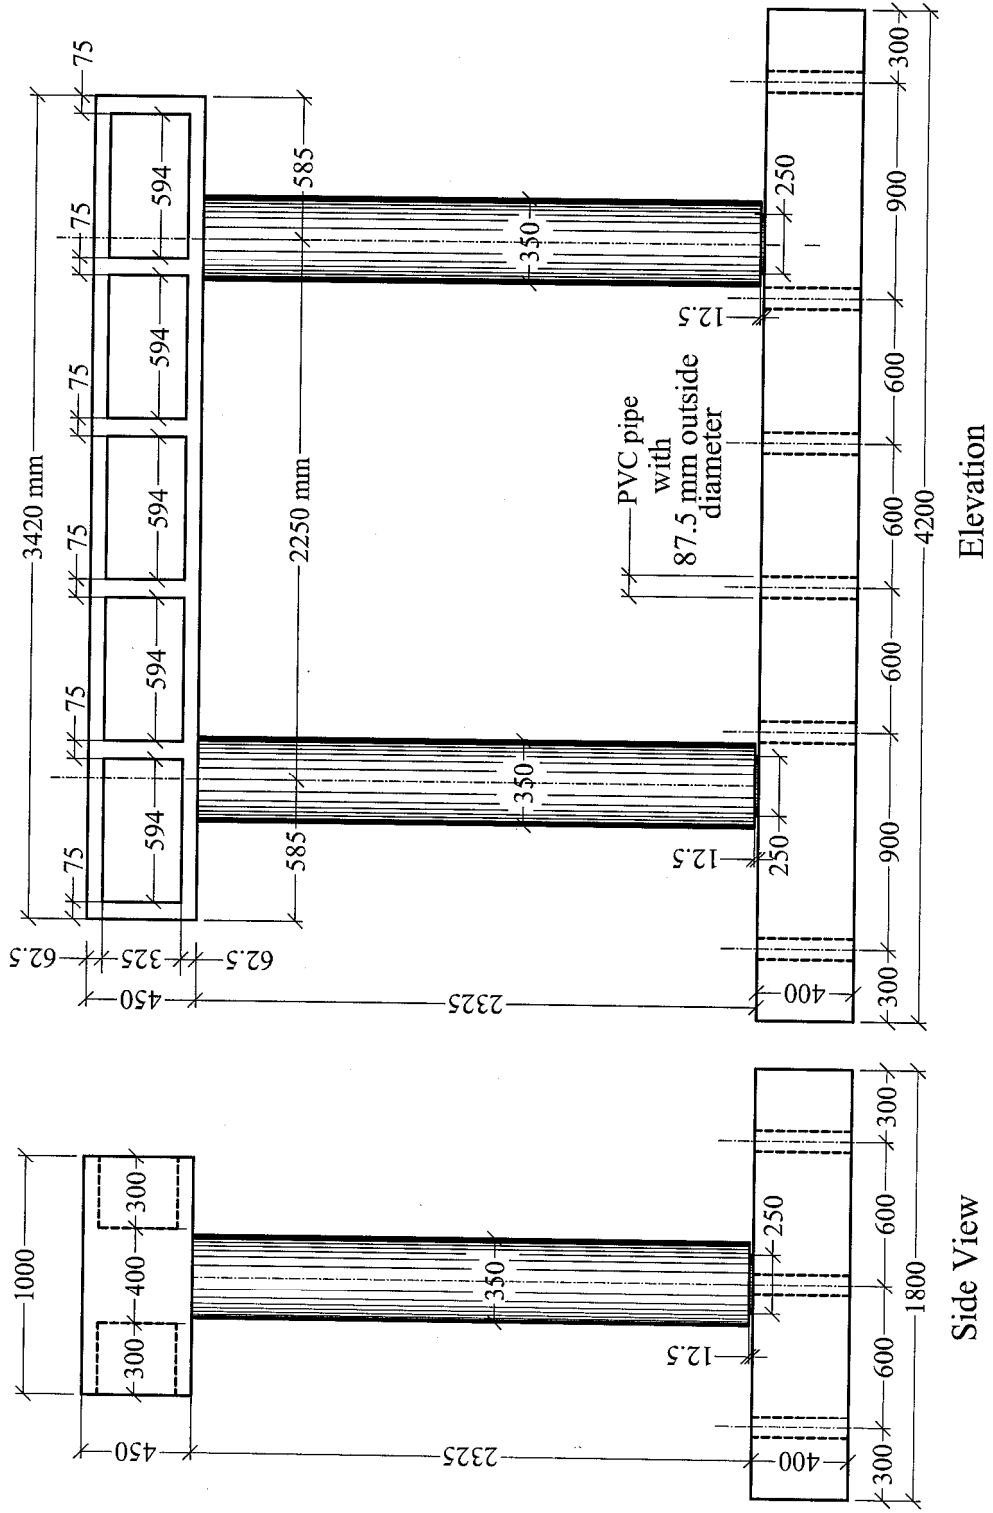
Concrete Dimensions of Specimen B2CT, (SI Units)
